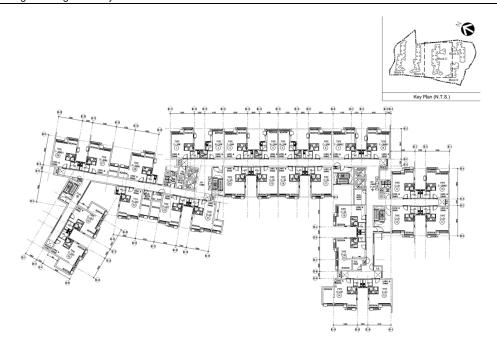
Proposed Scheme – Typical Floor Layout for Block C (5/F)
